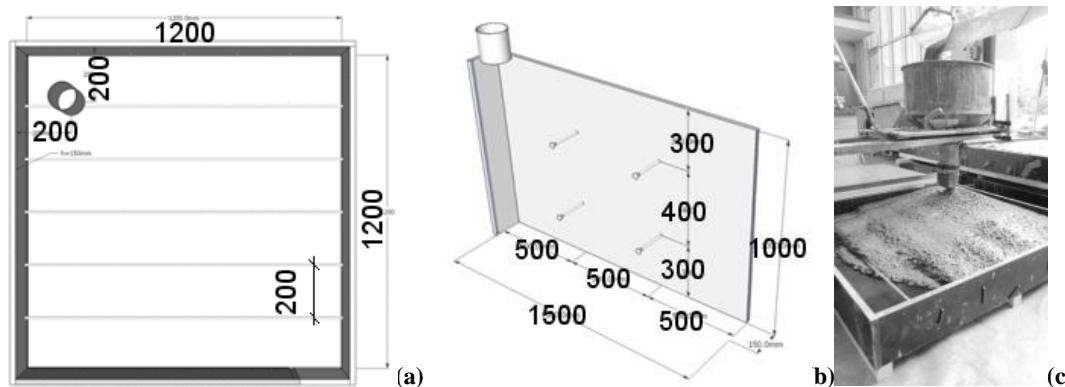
The dimensions of slabs and the rebar spacing in the reinforced slabs (a). The dimension of walls and the positions of tie bars (b). The funnel shaped barrel (c).
